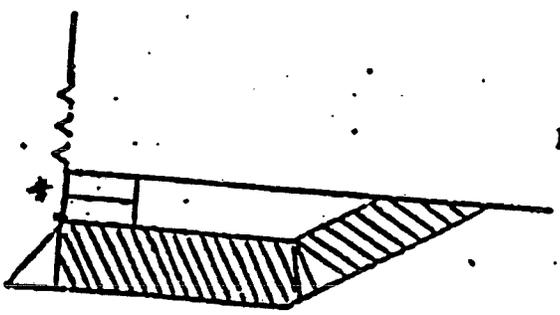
Extend Dryer Vent beyond 2 x 3 x 6 Doubler Vent Block and resecure to exterior side of mobile home.
